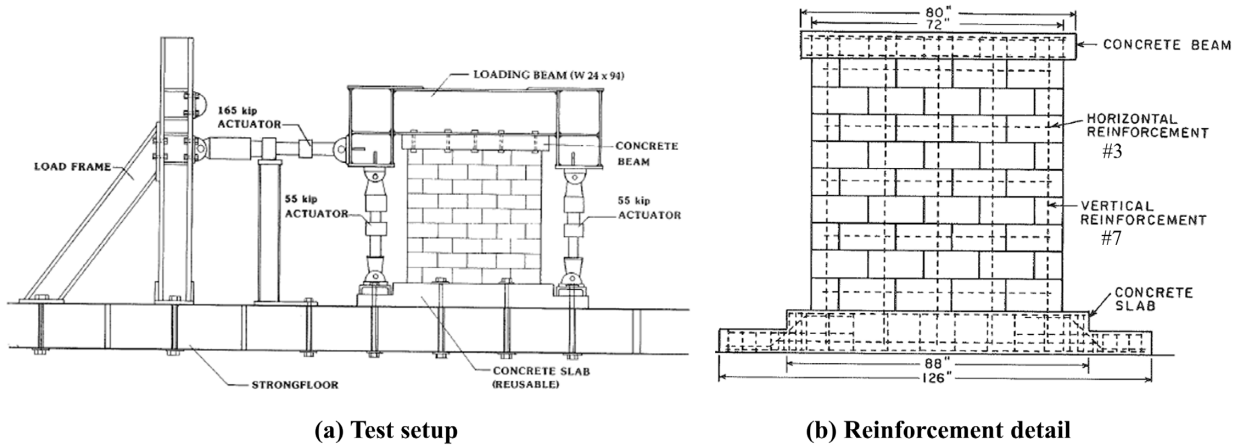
Test setup and reinforcement details of wall specimen Spec. 5 (Shing et al. 1991).
